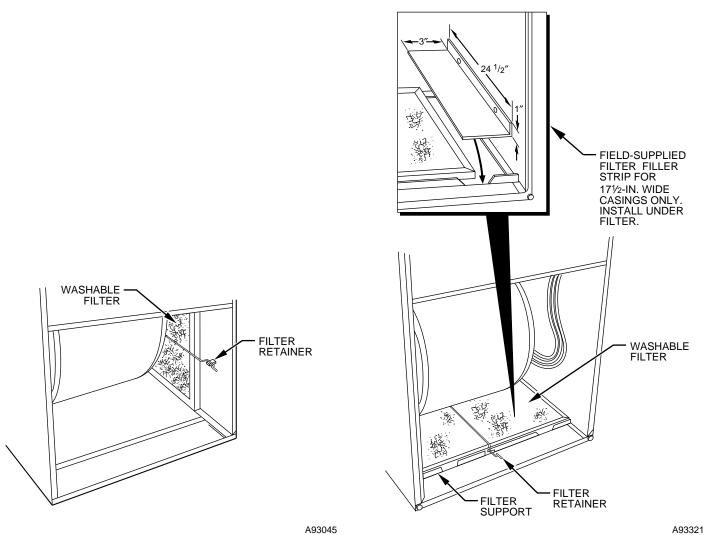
Side Filter Arrangement (Control Removed for Clarity)
